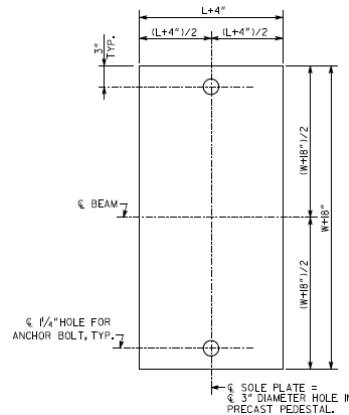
Girder bearing details showing a sole plate at the “FIX” end (Bents 1 and 3).
